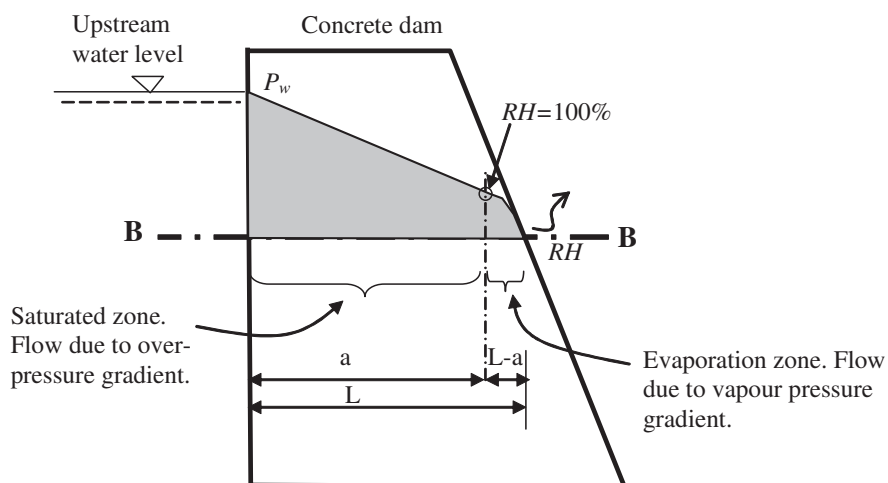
A schematic of a thick concrete dam with a combined water flow in a section B-B. In this section the upstream face is in water and the downstream face is in air. The section has one saturated zone and one evaporation zone
